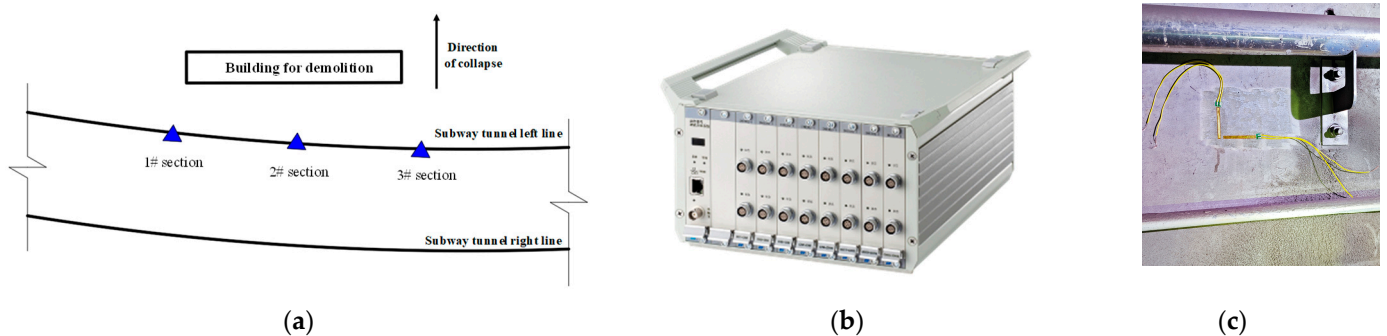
Vibration monitoring point layout: (a) Vibration monitoring point layout; (b) On-site layout of hall and track bed.
